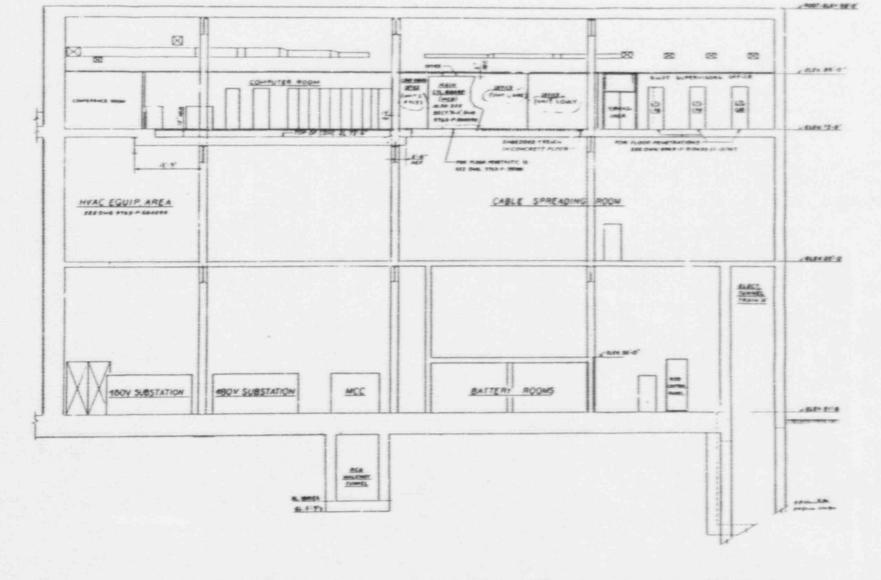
Seabrook 1 Control Building Section, Looking North
